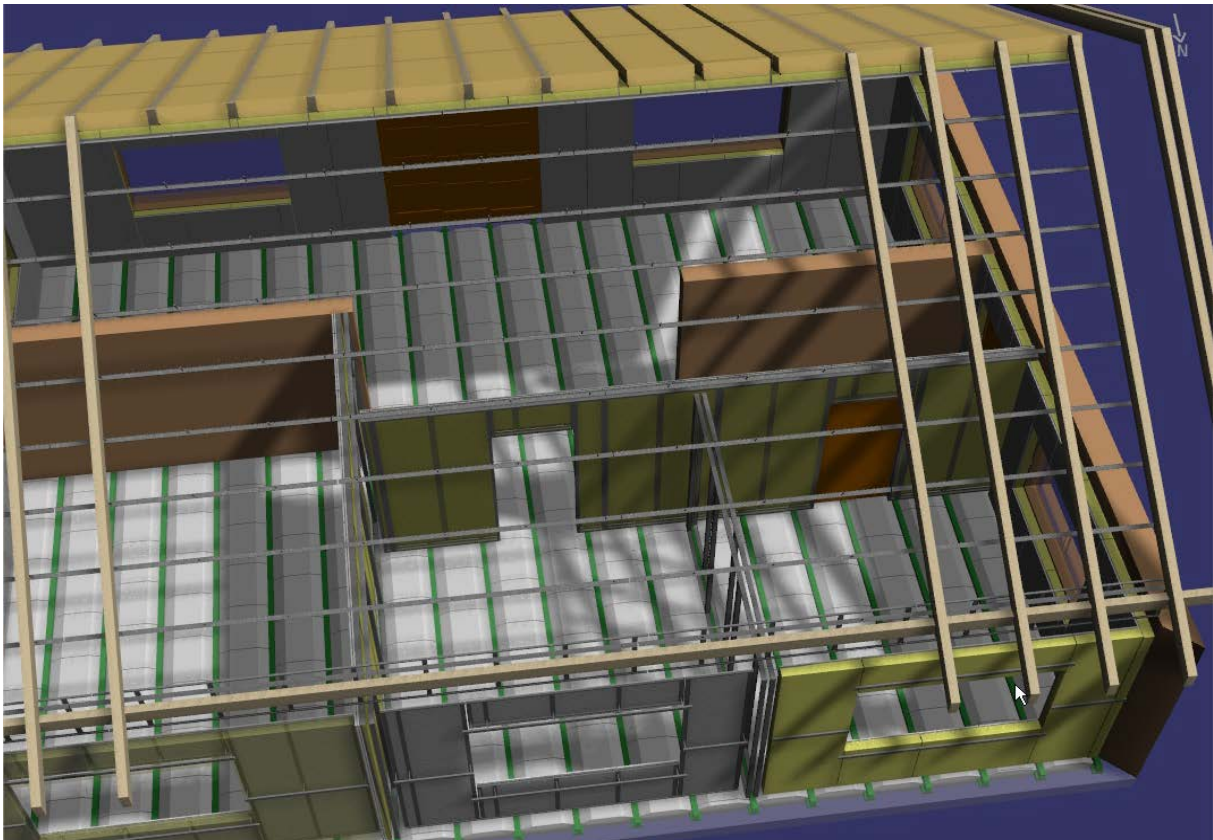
Example of an enriched BIM including execution details for roof and attic, slabs, internal separations and external walls.
